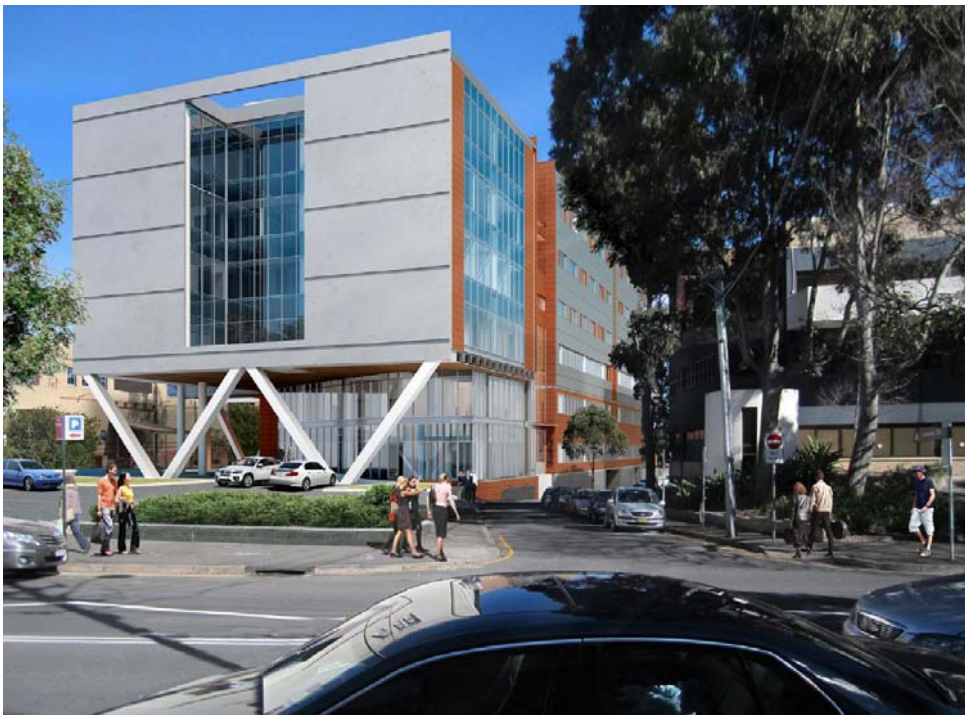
Photomontage of the proposed building as viewed from Missenden Road
